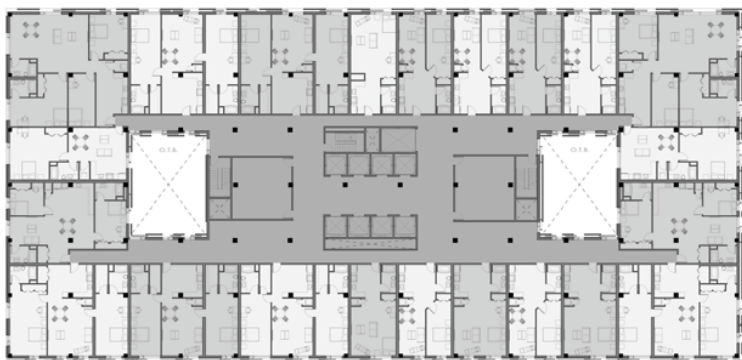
Proposed typical residential floor plan. Source: (Author 2013)
